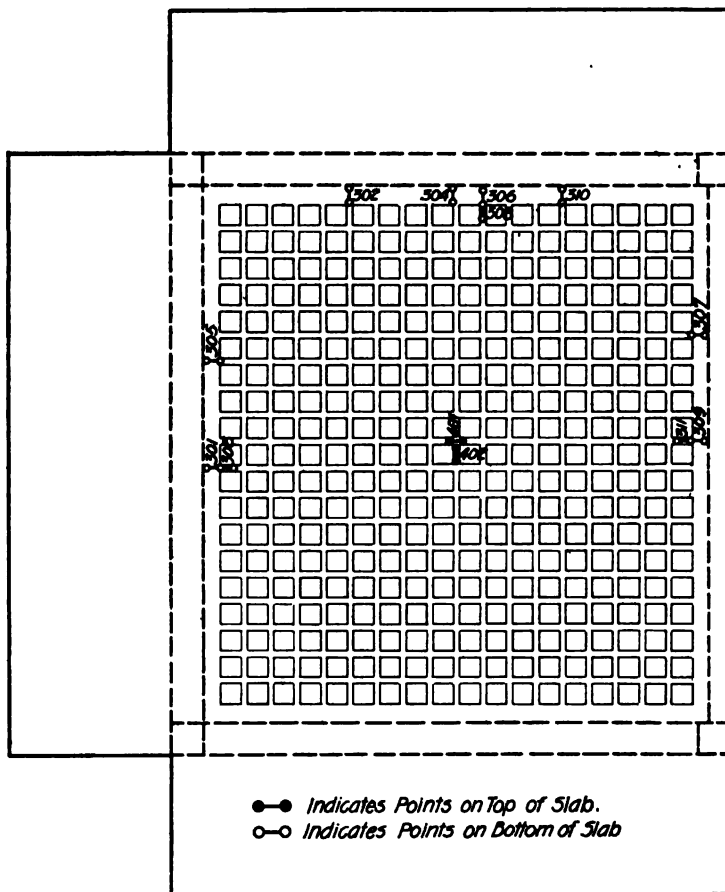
PLAN SHOWING LOCATION OF GAUGE POINTS ON CONCRETE.
